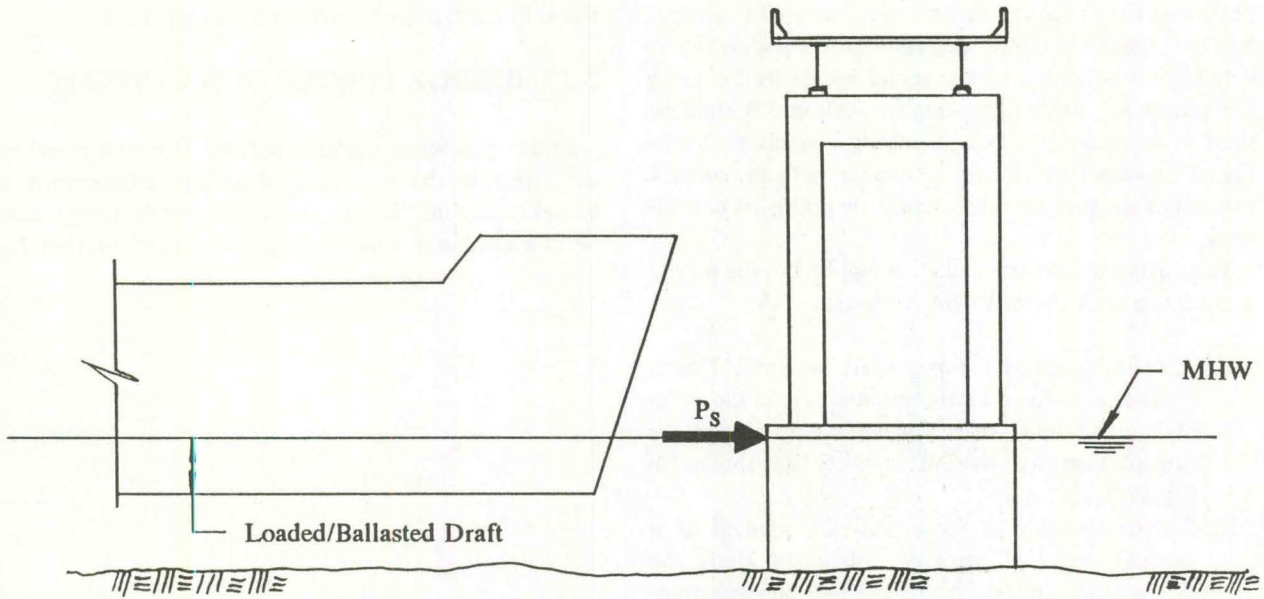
Ship Impact Concentrated Force on Pier (For Foundation Design & Overall Stability).
